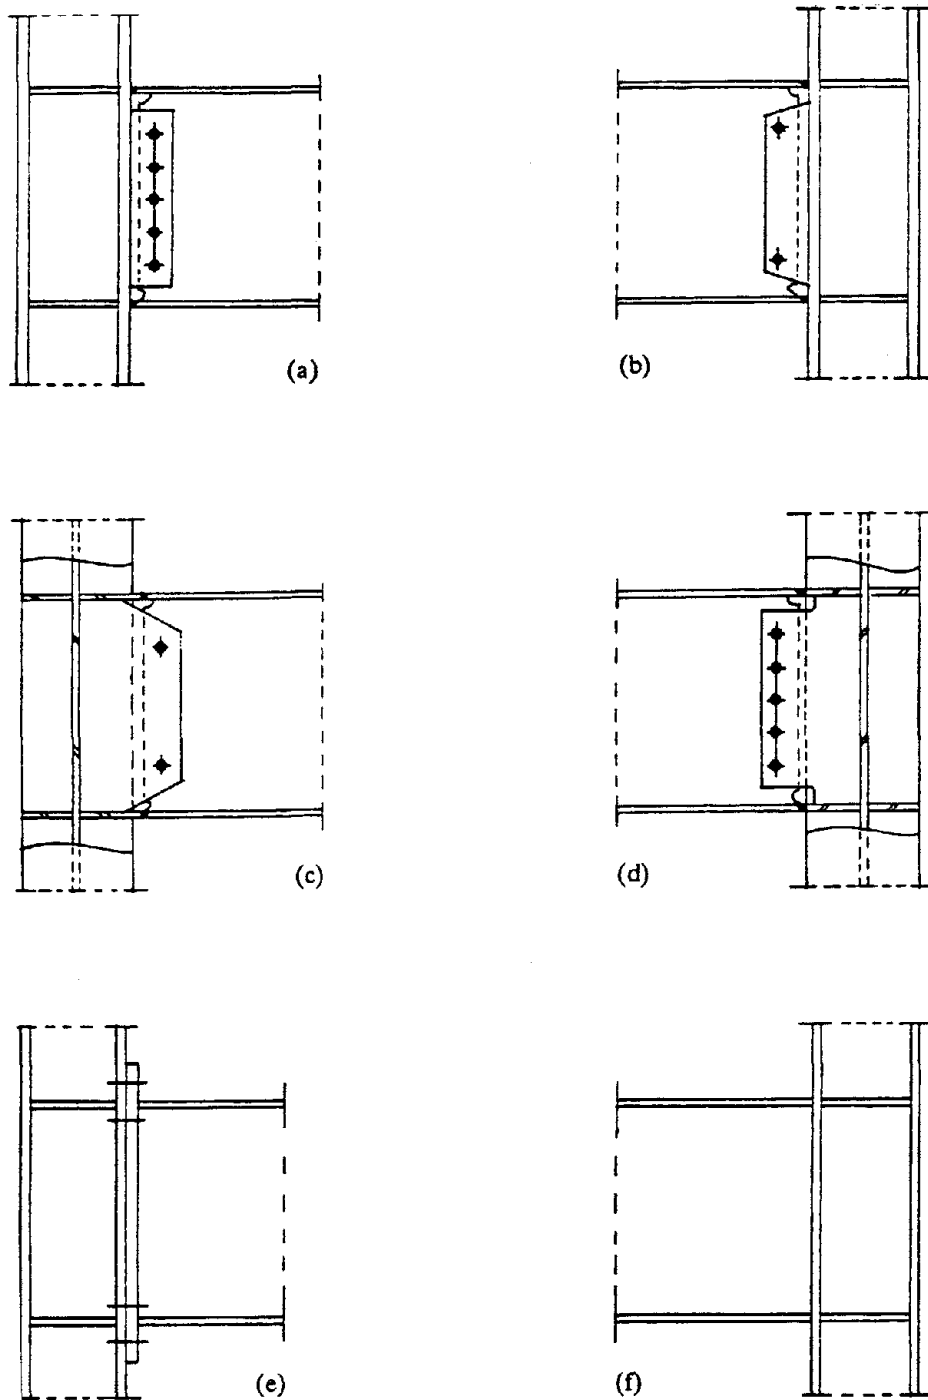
Typical Beam-to-Column Moment-Resisting Connections.
